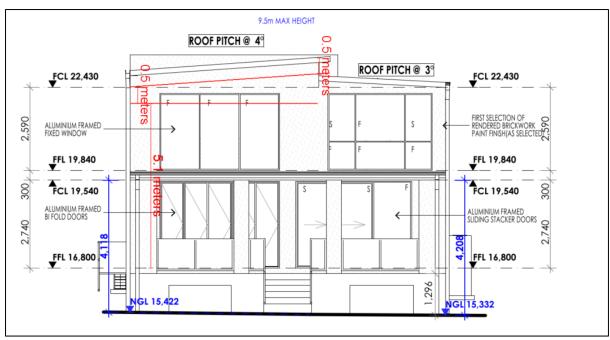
Western elevation showing conditioned changes to ceiling height above void and associated roof line
